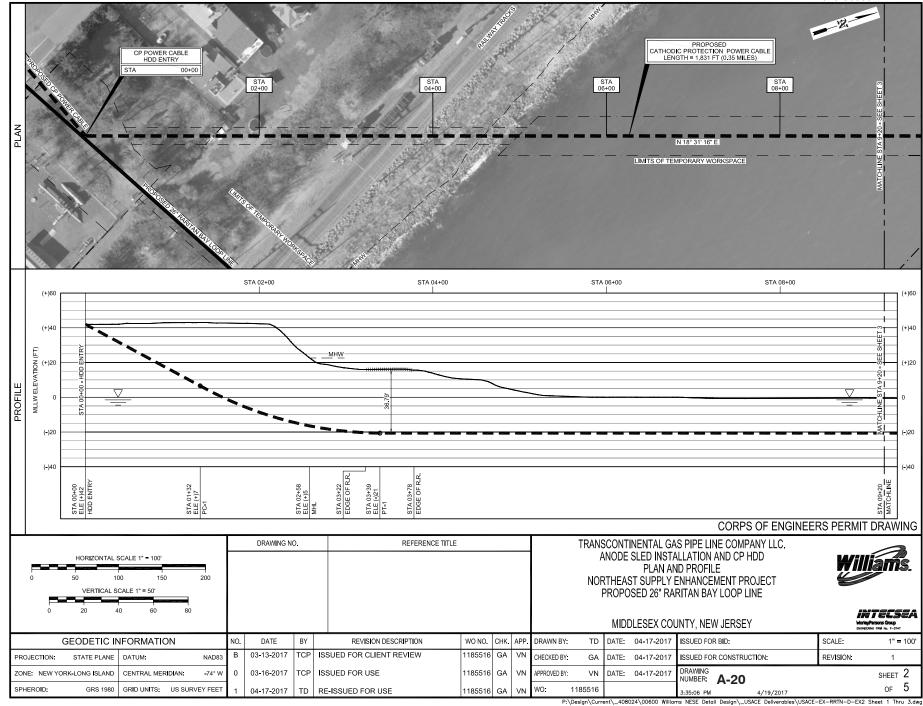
Anode Sled Installation and CP HDD Plan and Profile
